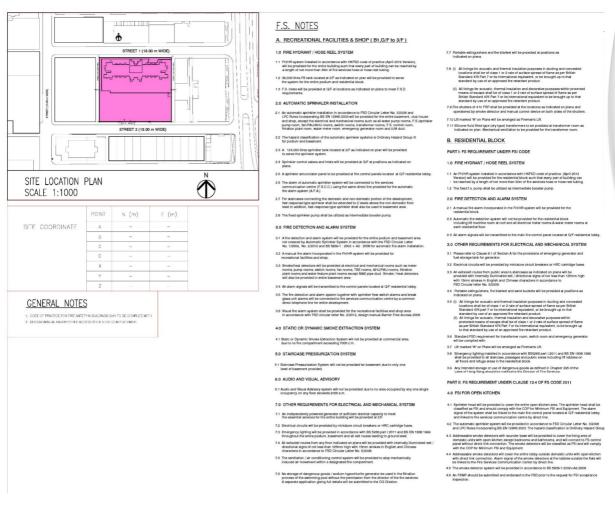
Site Location Plan and Notes extracted from PNAP ADV-33
